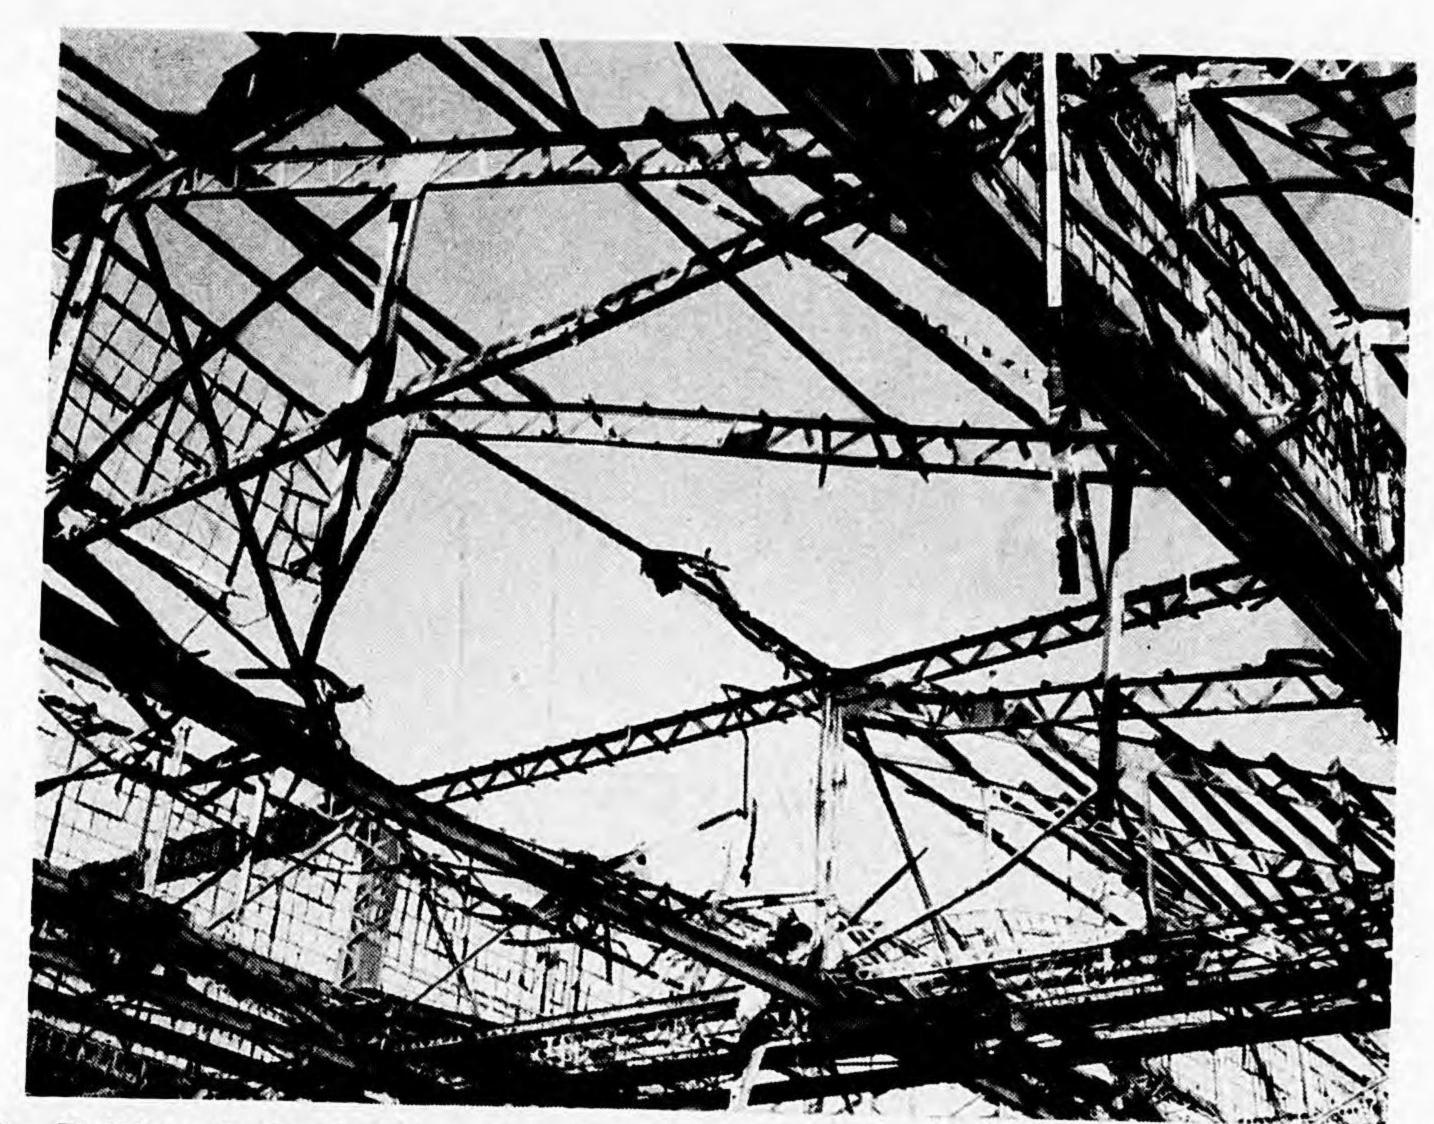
Building 3, Bomb 12; roof steel damaged; horizontal members intact. (Image reversed).
